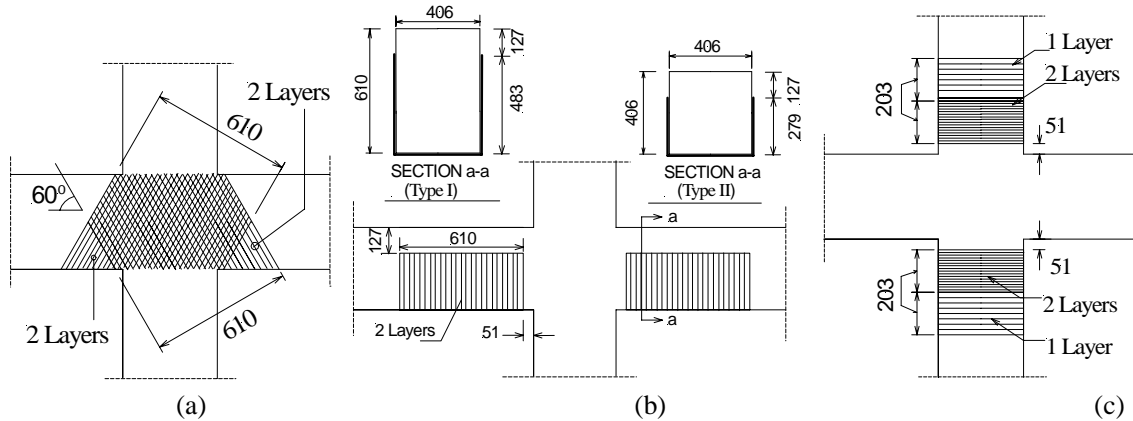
(a) CFRP joint shear reinforcement, (b) CFRP beam shear reinforcement, (c) CFRP column confinement and shear reinforcement.
